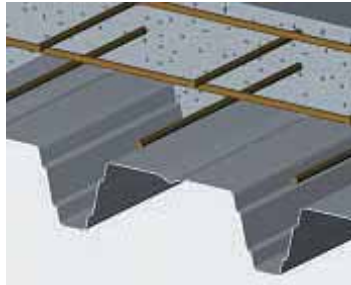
Cofrasol floor (Floor systems guide, ARVAL, 2013)
